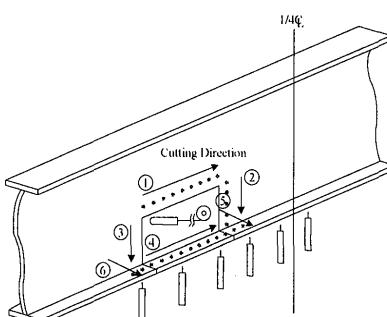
Model of repair welding experiment and dimensions.
